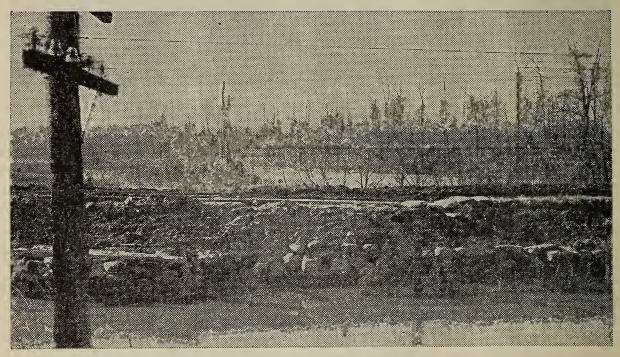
Flood damage to Jefferson Davis Highway, near Malone, Miss. Note timber damage in background.
